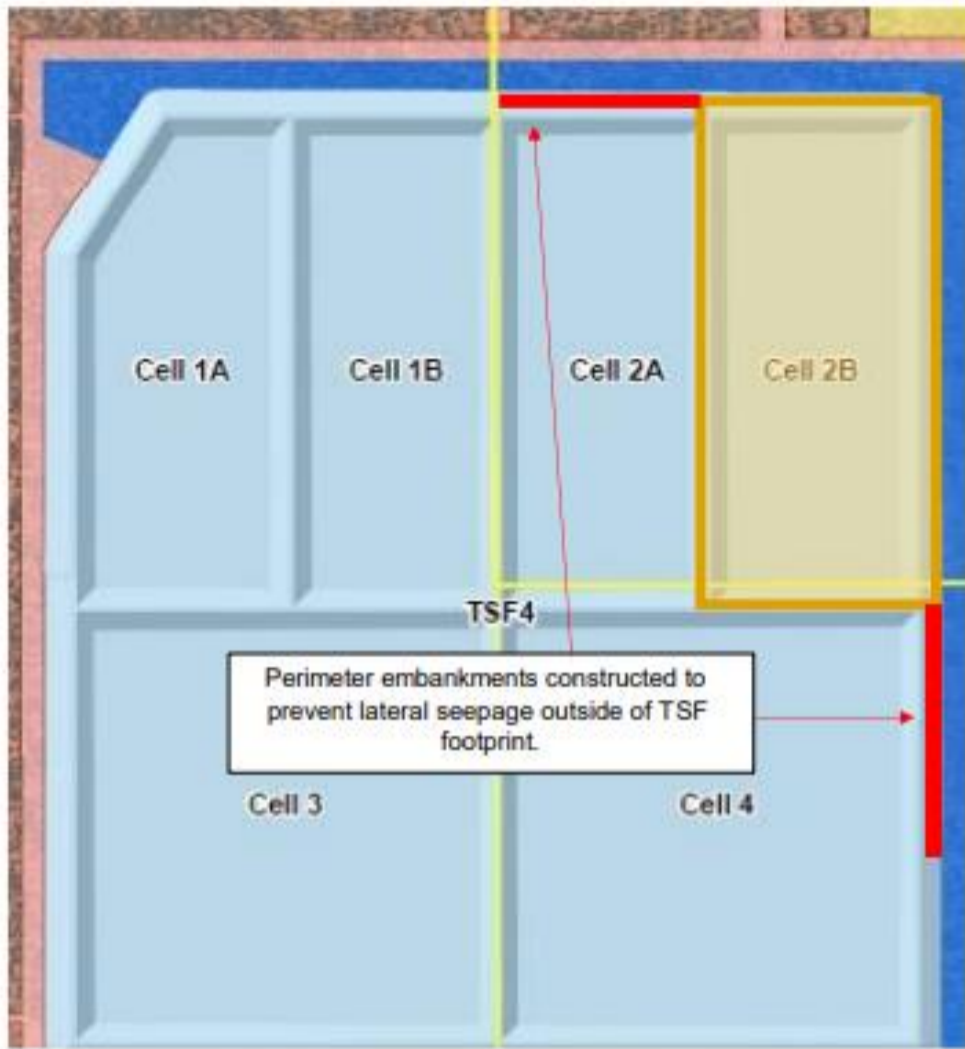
Plan showing Stage 1 of the TSF construction – Cell 2B construction
